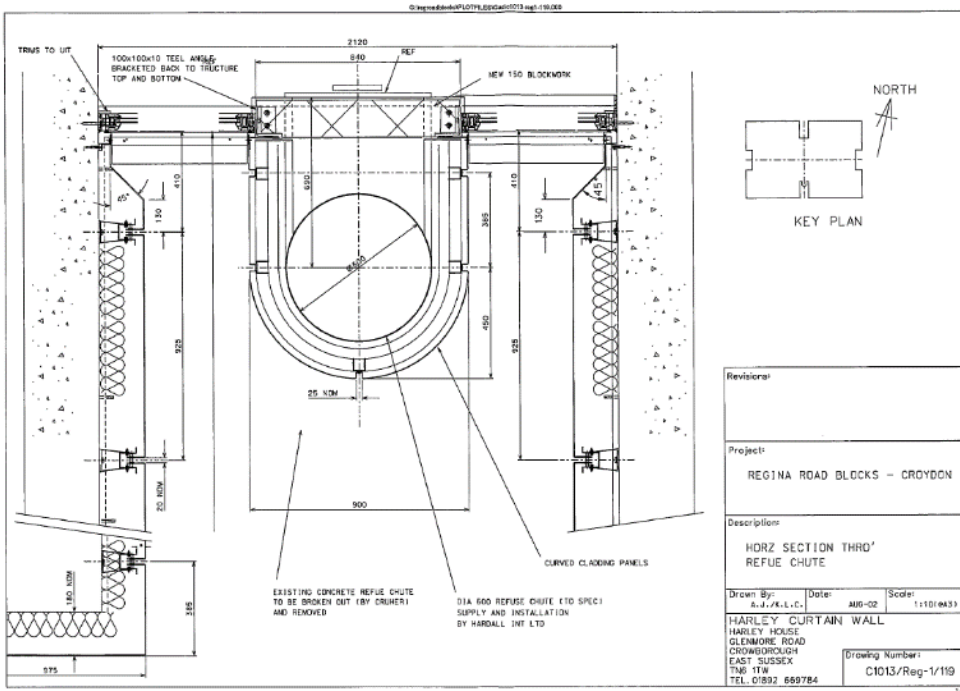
Over cladding record drawings for 'Regina Road Blocks' dated Aug. 2002 showing proposed refuse chute
